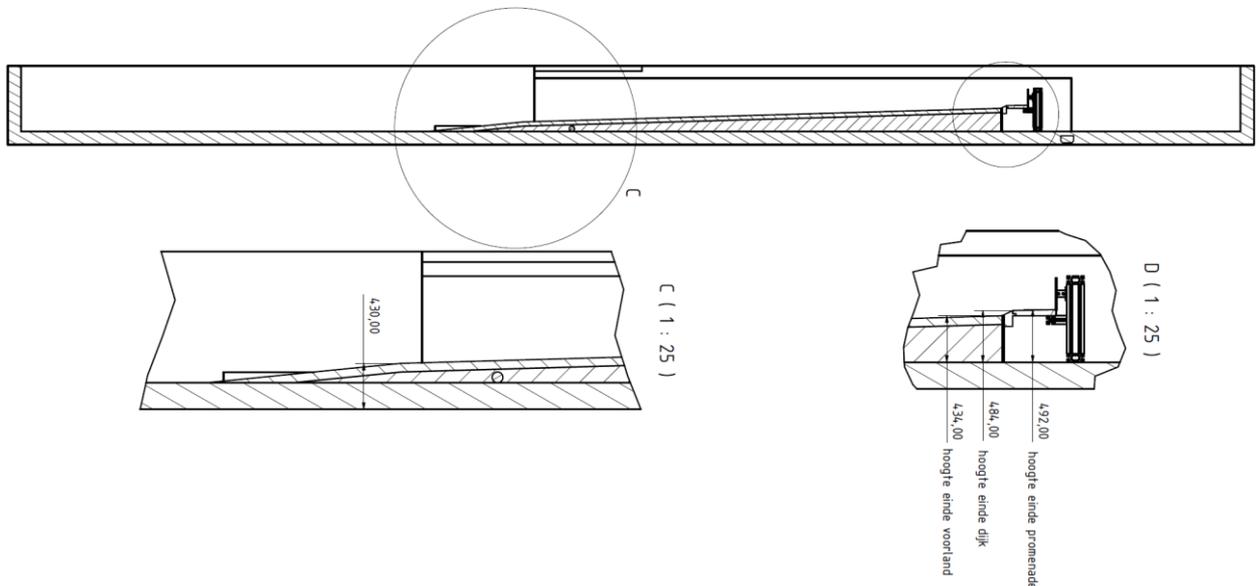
Cross section of the experimental layout. Details of the slope transition and of the dike and wall setup (dimensions are in [mm])
